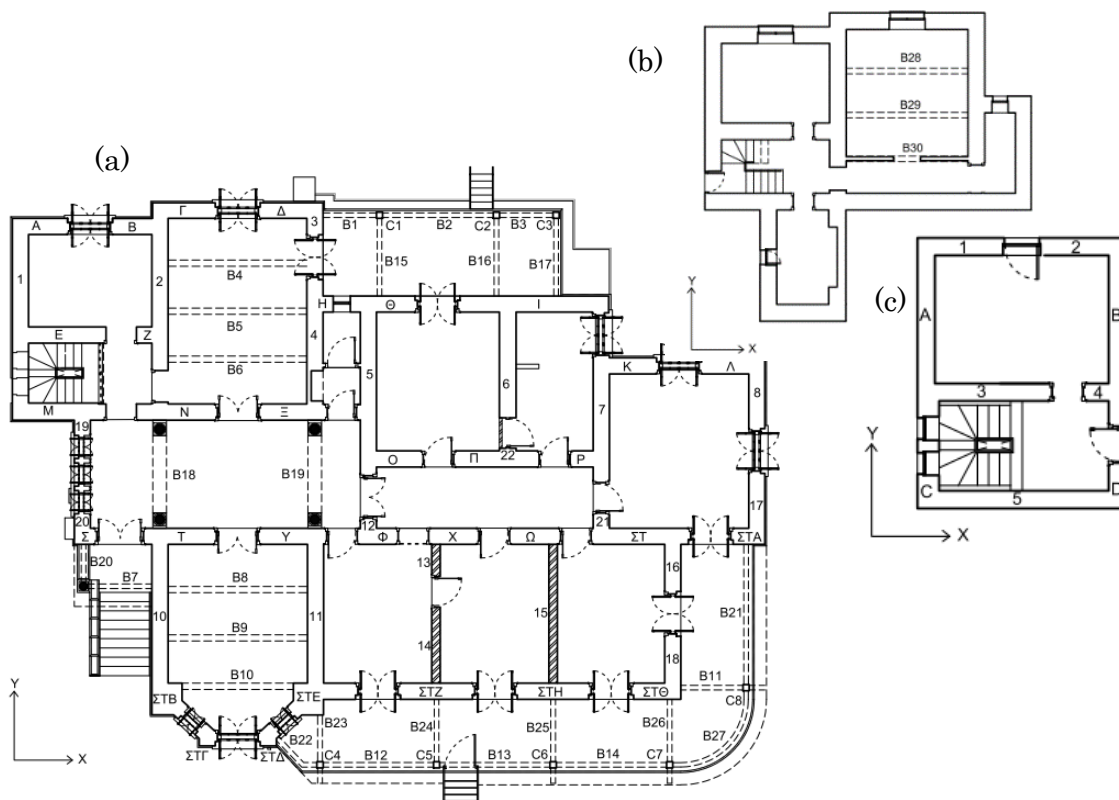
(a) Ground floor plan, (b) Basement plan and (c) 1st floor plan
